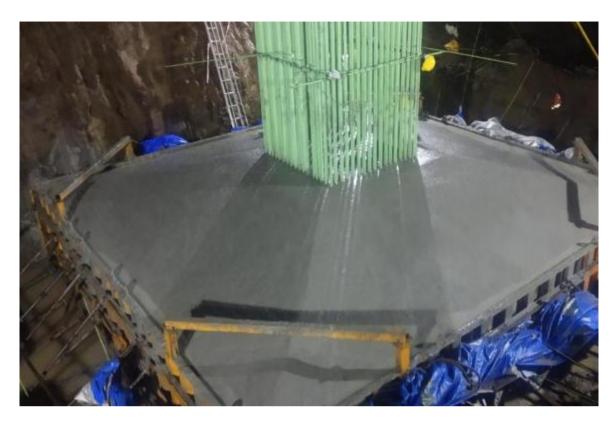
Concrete pouring at Foundation No. LP 38, Chirle completed
